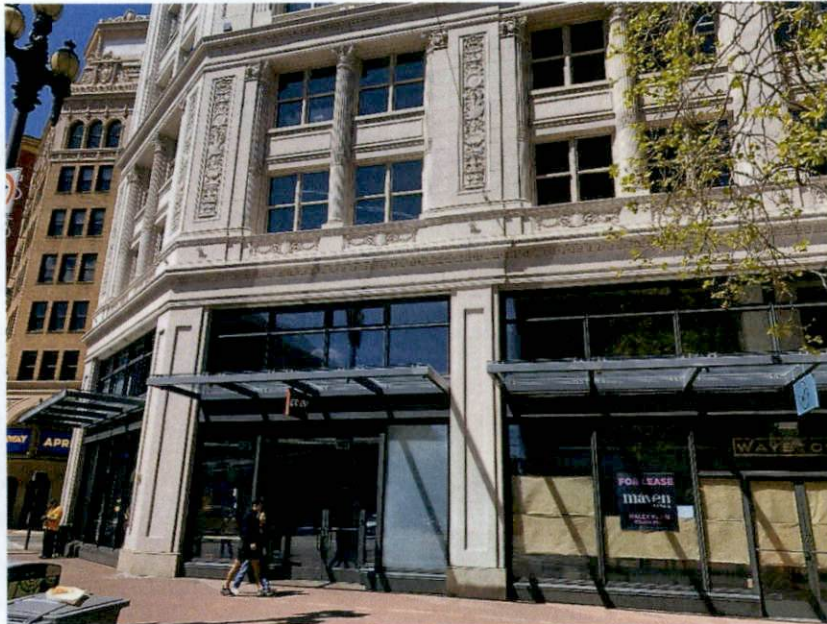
Photo C: View of granite wall base at ground level storefront entrance along Market Street elevation. Looking north.
